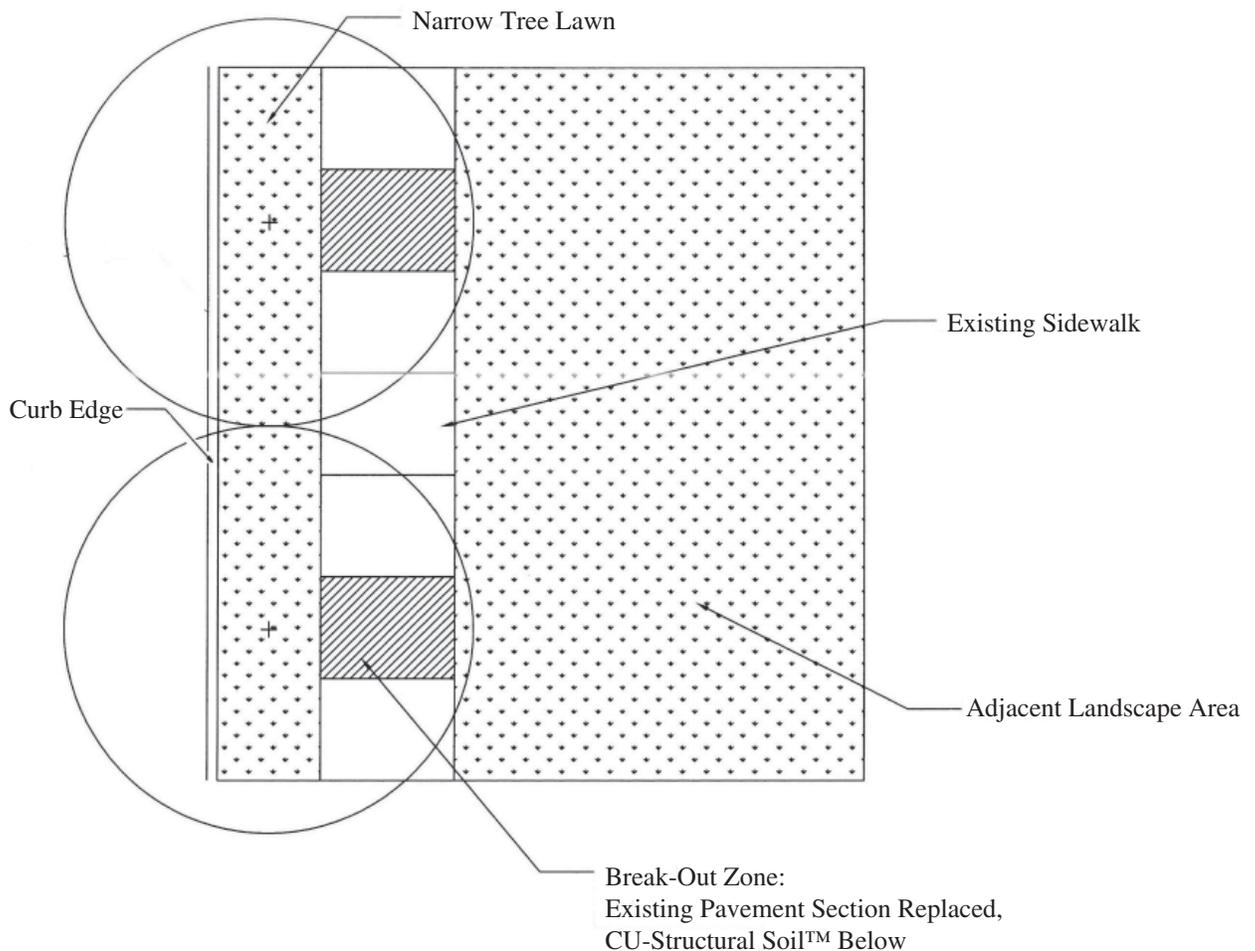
Plan view of retrofitted CU-Structural Soil™ break-out zone
